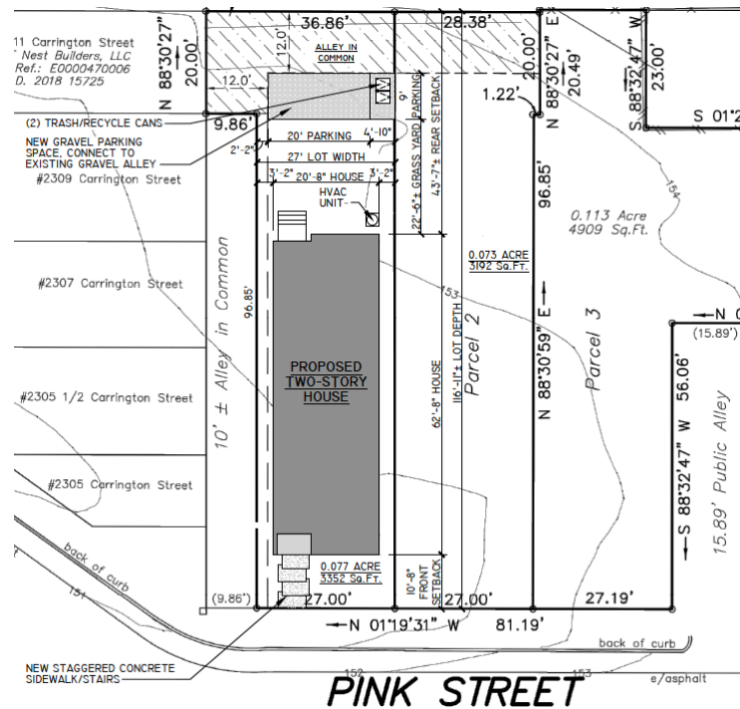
Plan of proposed parcel layout and proposed dwelling along Pink Street
